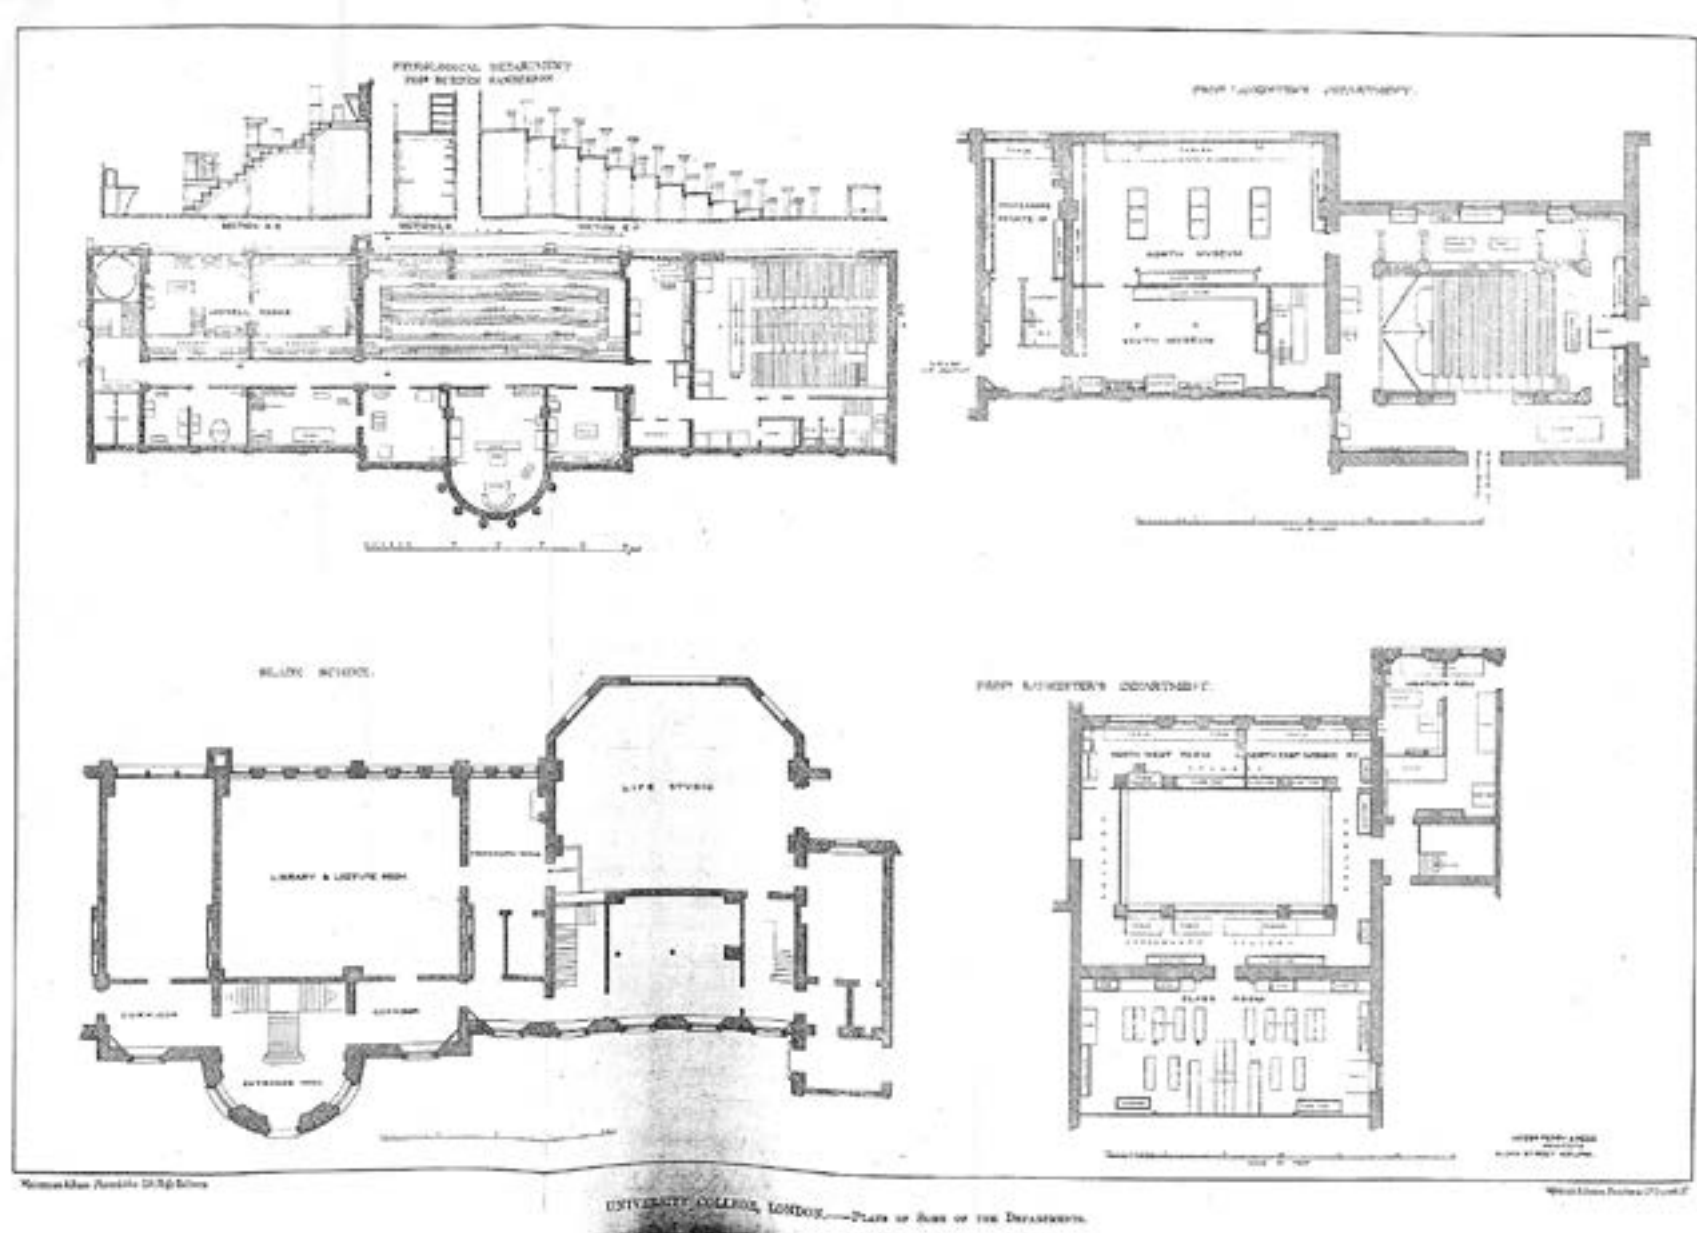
Plan of the North Wing for the Slade School of Art, designed by T. Hayter Lewis
